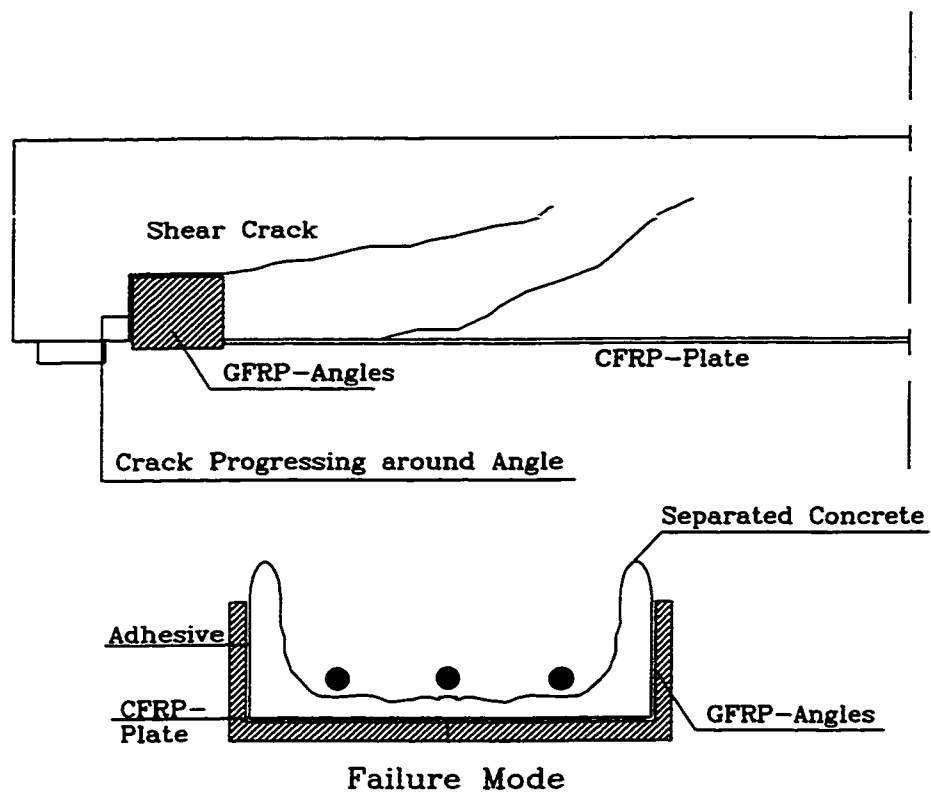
The End Anchorage and The Cracks at Failure, Garden et al. (1997)
